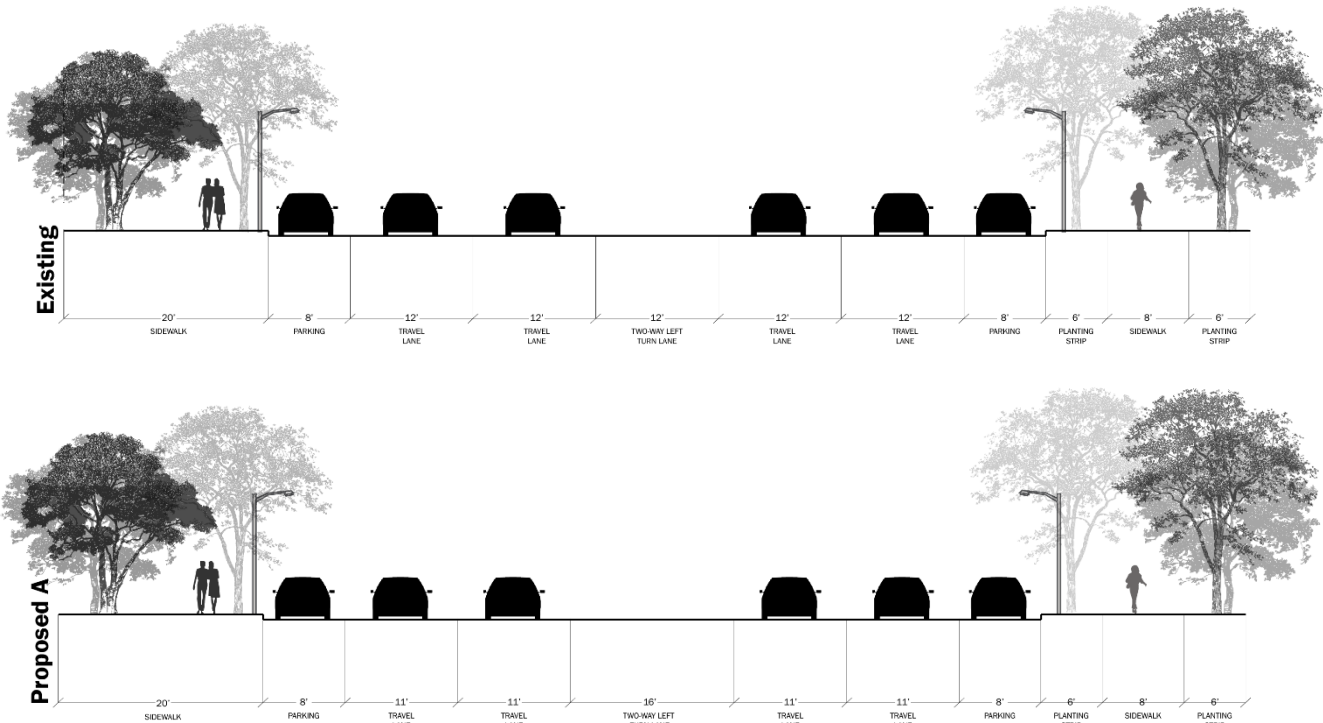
Existing (top) and Proposed (bottom) cross section, State Street (13th Street to 20th Street)
